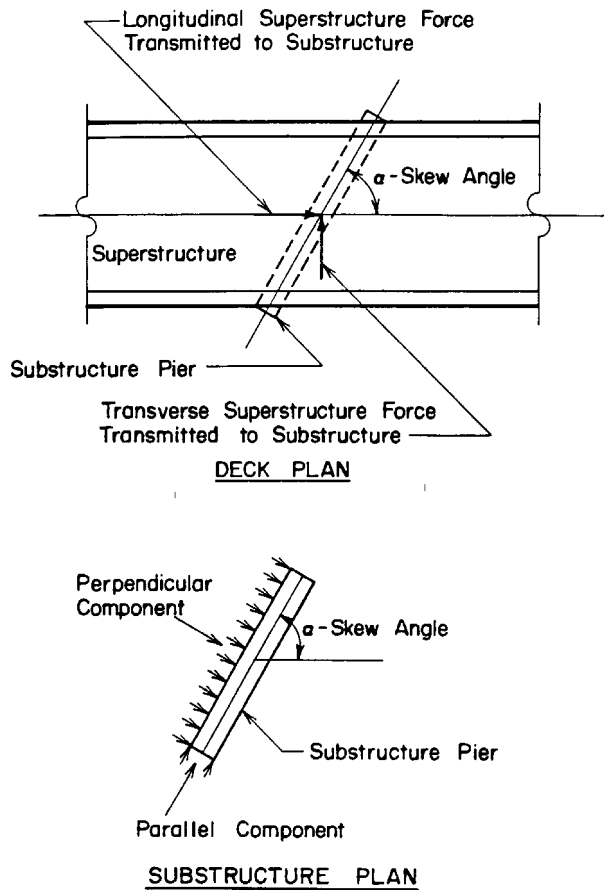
P-1 - Force Resolution to Substructure
